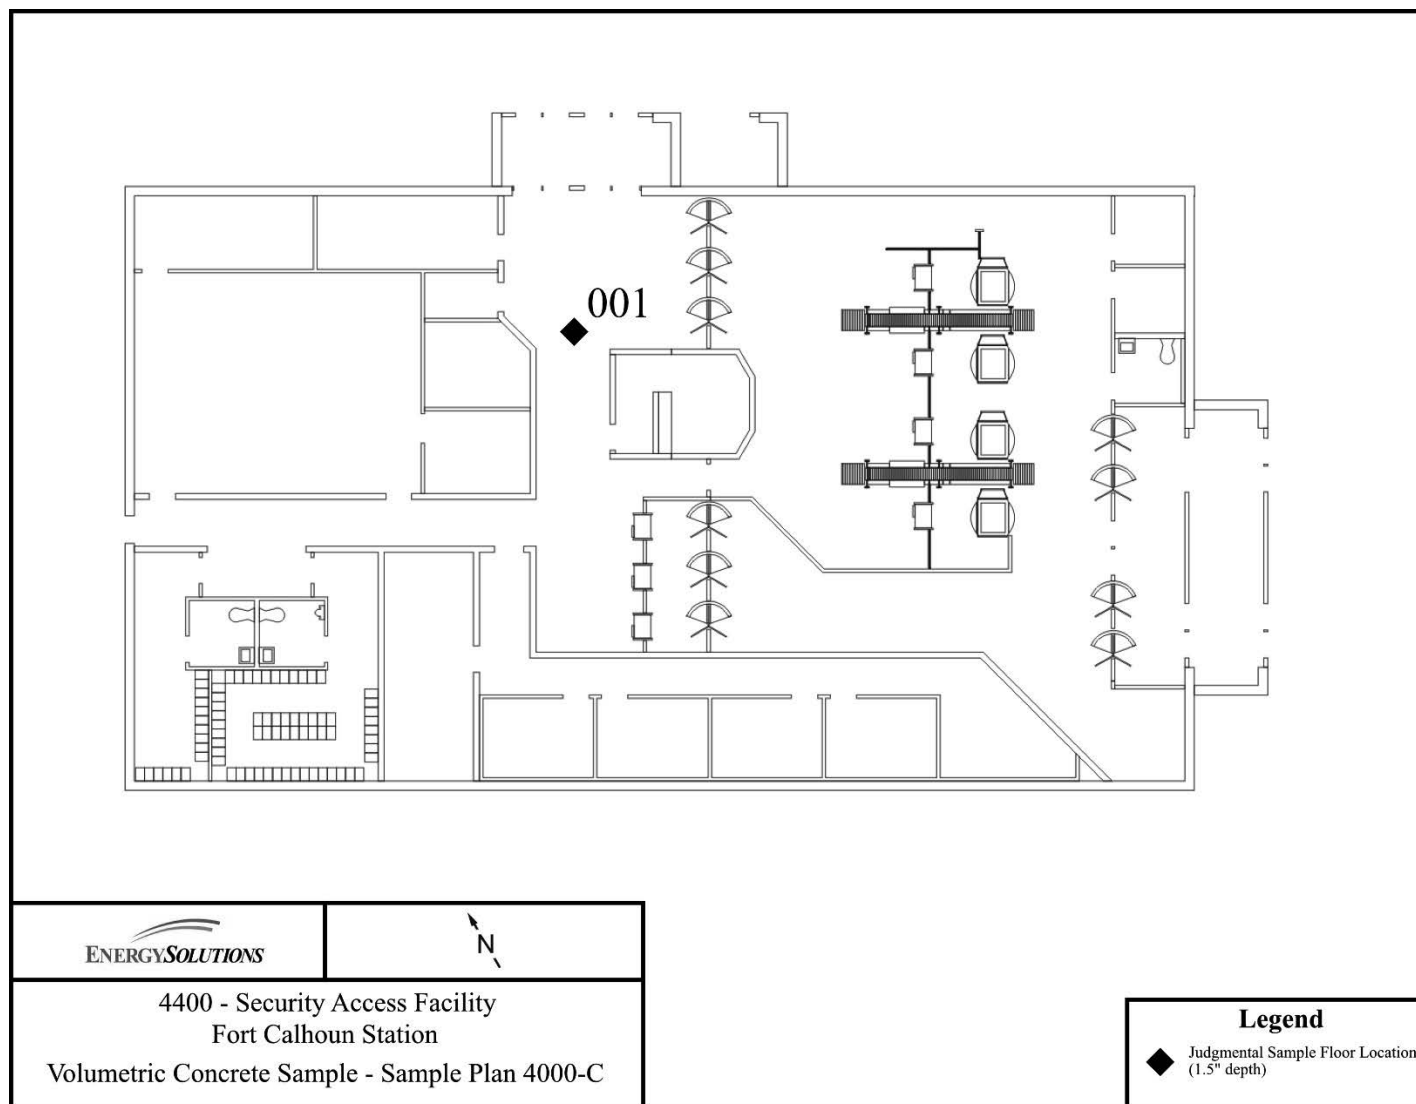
Volumetric Concrete Sample Location in Security Building
